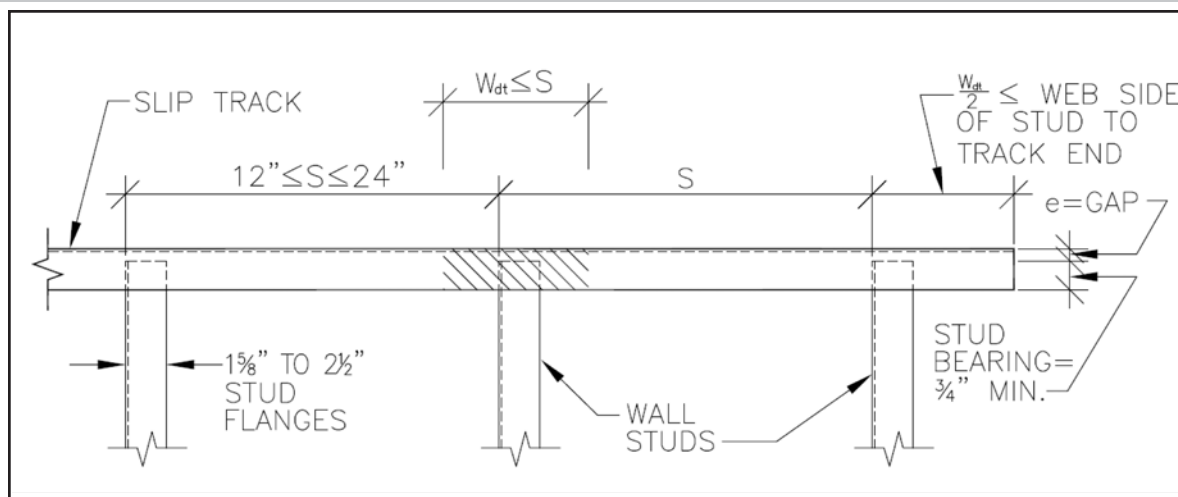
ELEVATION OF SLIP TRACK AT STUD BEARING
